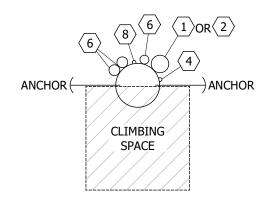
DEADEND CONSTRUCTION SINGLE POWER RISER
